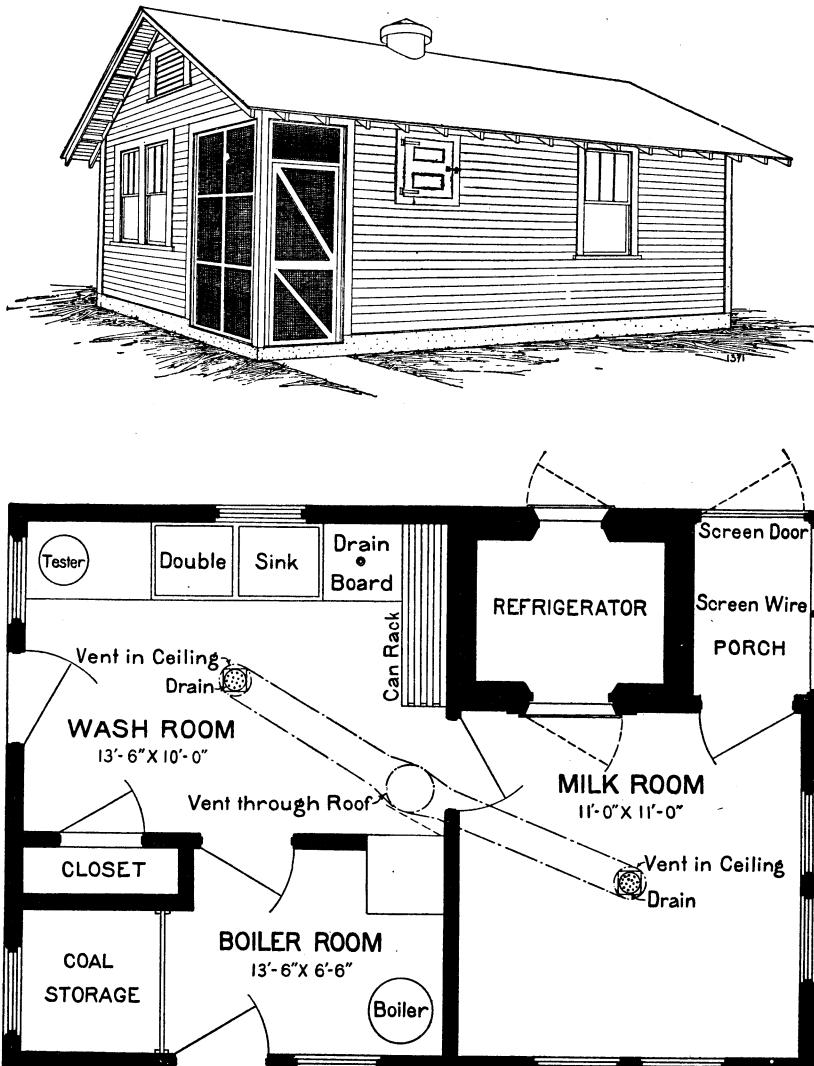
An arrangement for a 20 to 40 cow dairy where the milk is bottled. The building is 18 by 26 feet and contains 3 rooms besides a cold-storage room or refrigerator. Design No. 633. Perspective view shows rear and right side of plan.
